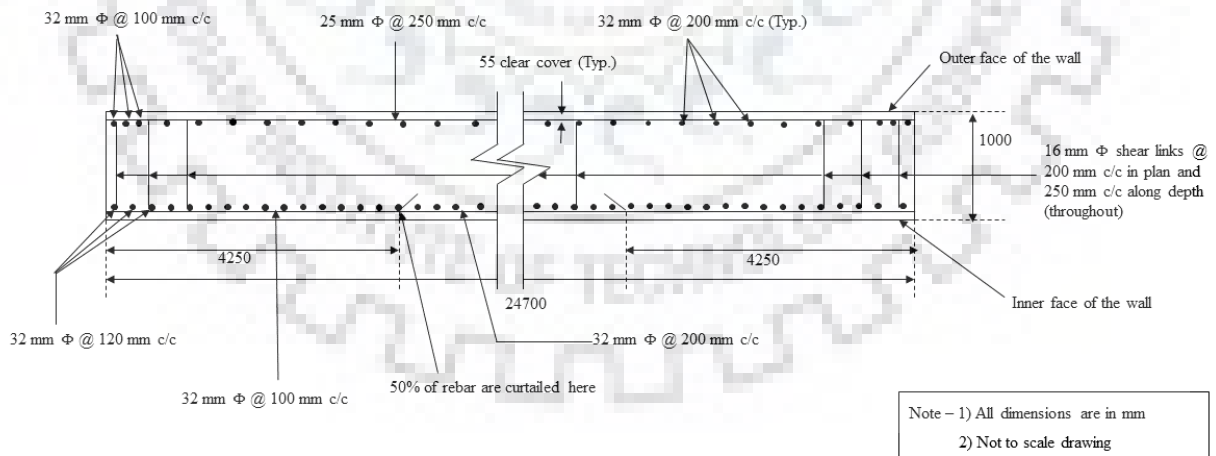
Detailing of Section A-A of front wall for zone - A
